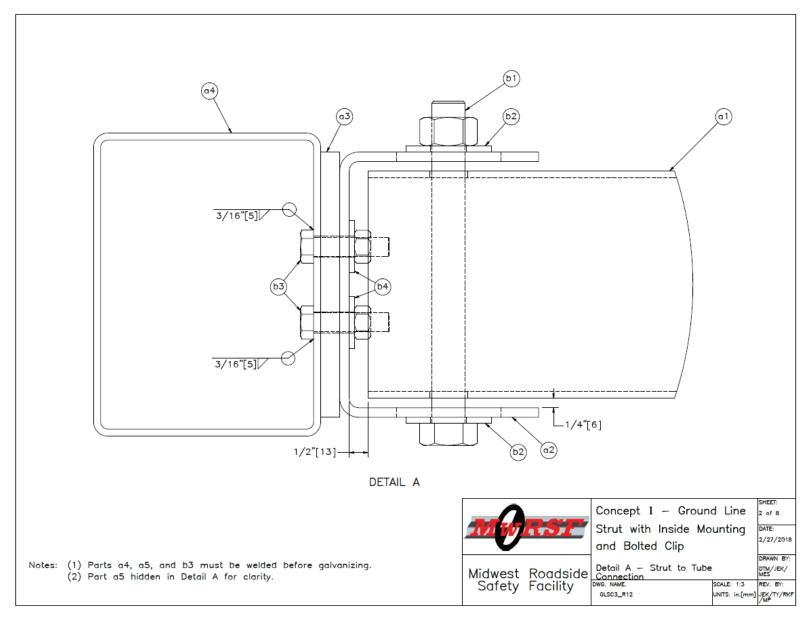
Ground Line Strut Design Concept No. 1 – Strut to Tube Connection
